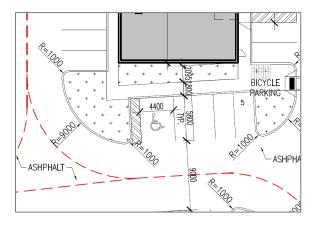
Image clip from the site plan highlighting the AODA parking space west of Building C that requires a depressed curb and signage.
